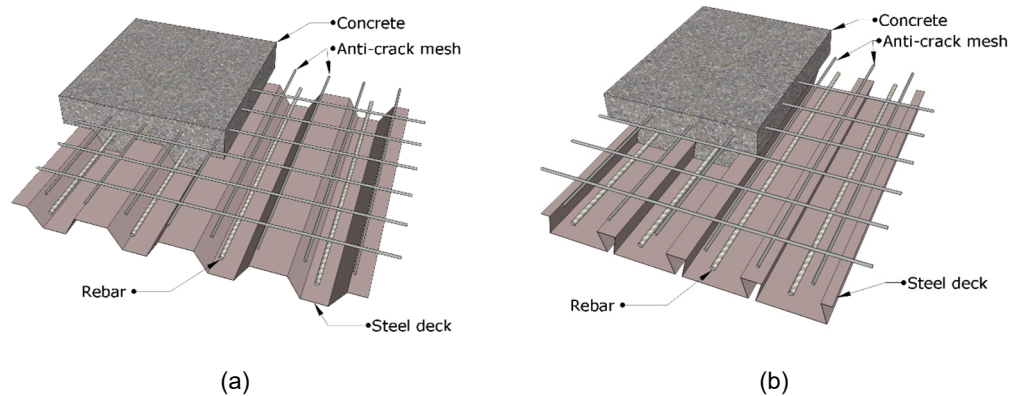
Typical layout of a composite slab with the (a) Trapezoidal and (b) Re-entrant steel deck.
